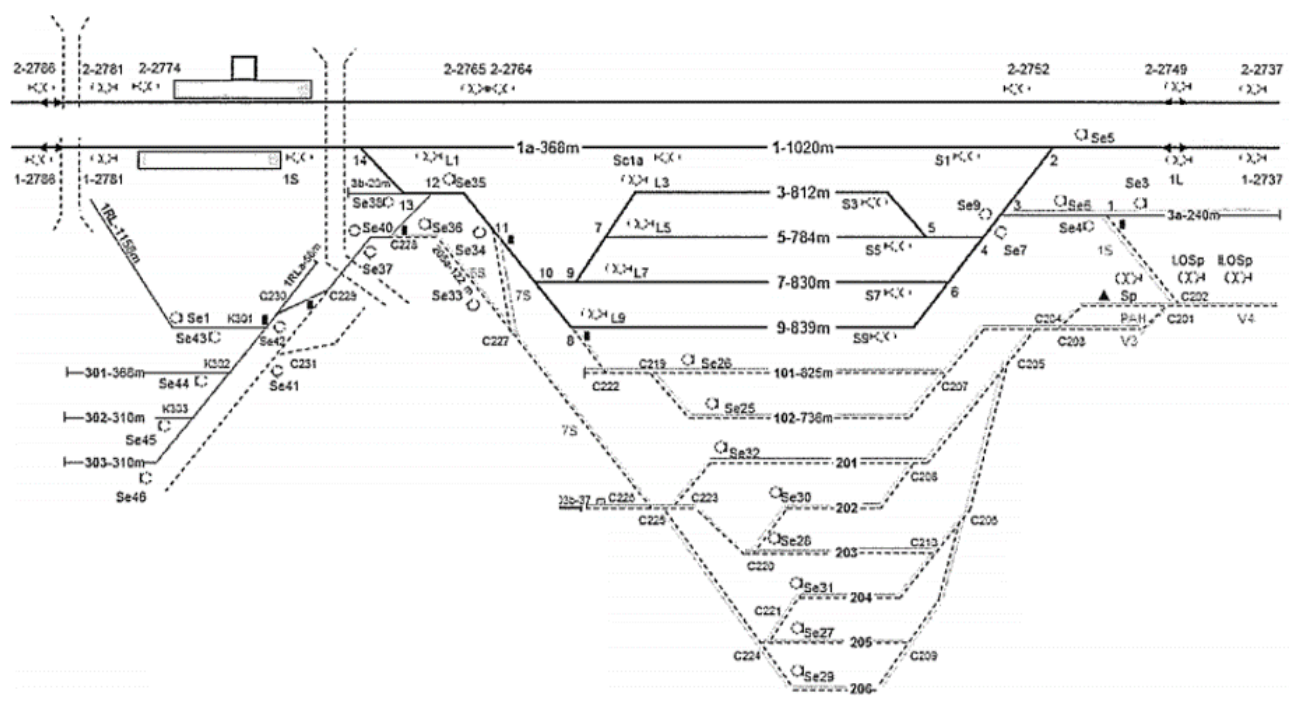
Scheme of a Rail Yard of RS A and Railway Siding A Source: [5]
